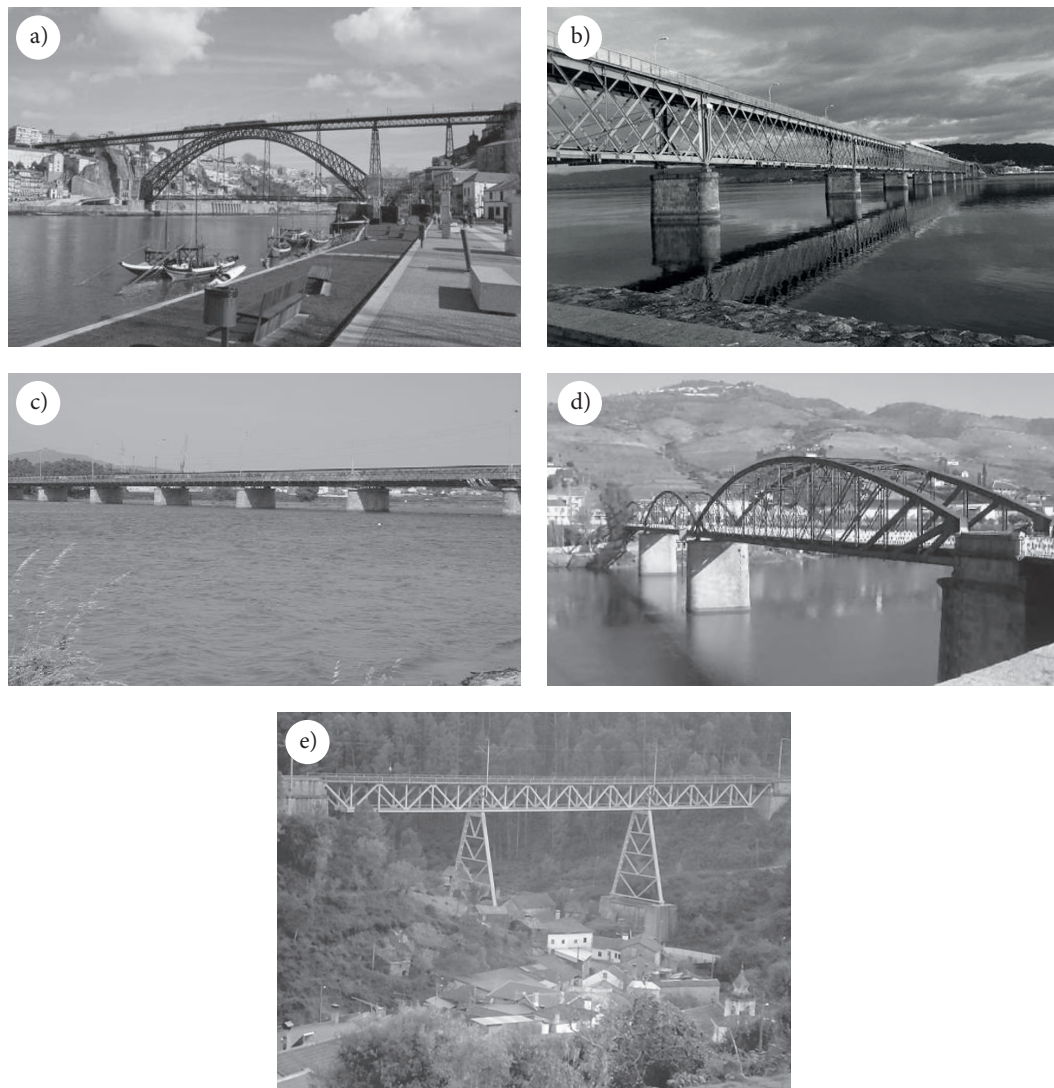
(a) Luiz I bridge (adapted from Fernandes *et al.* 2004); (b) Eiffel bridge (adapted from Jesus *et al.* 2011); (c) Fão bridge (adapted from De Jesus *et al.* 2014a); (d) Pinhão bridge (adapted from Figueiredo *et al.* 2004); (e) Trezói bridge (adapted from Correia *et al.* 2008a)
